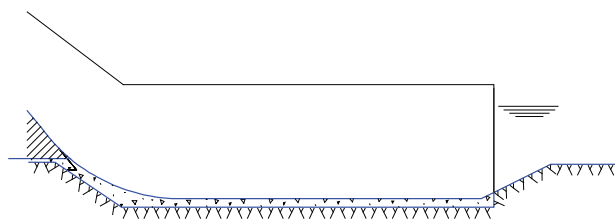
Typical cross-section of a stilling basin.
